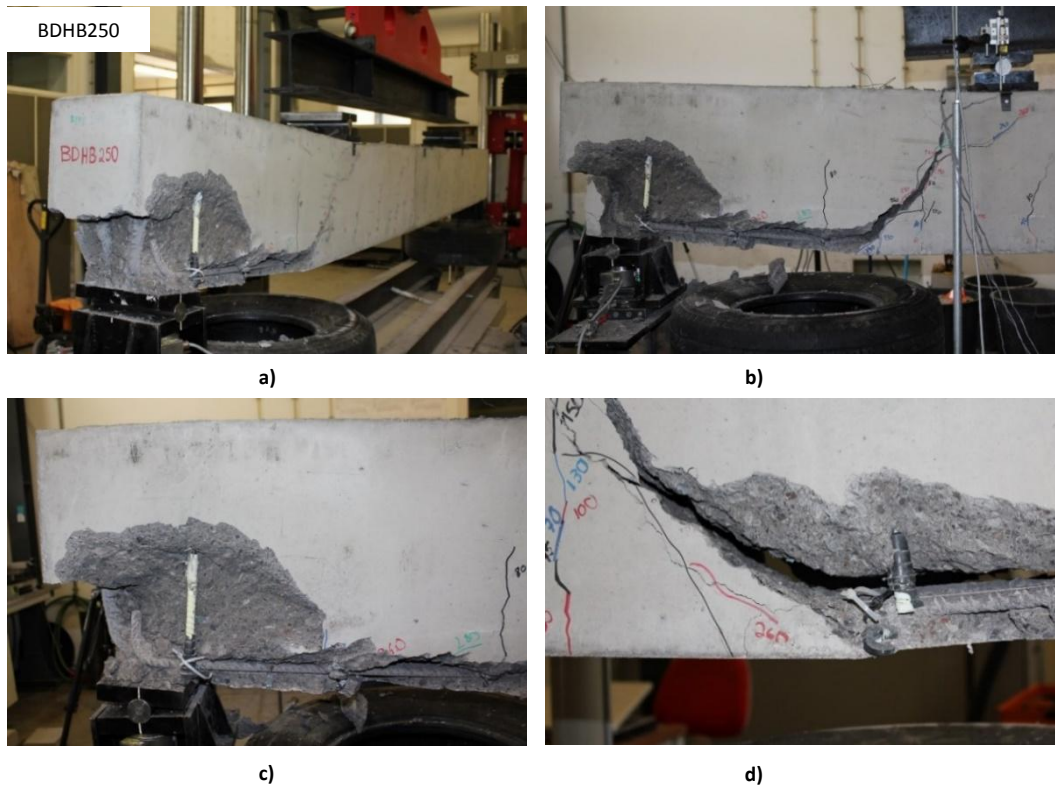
BDHB250 beam failure: a) overall view; b) view near the support; c) pull-out of longitudinal reinforcement; d) fractured lower head
